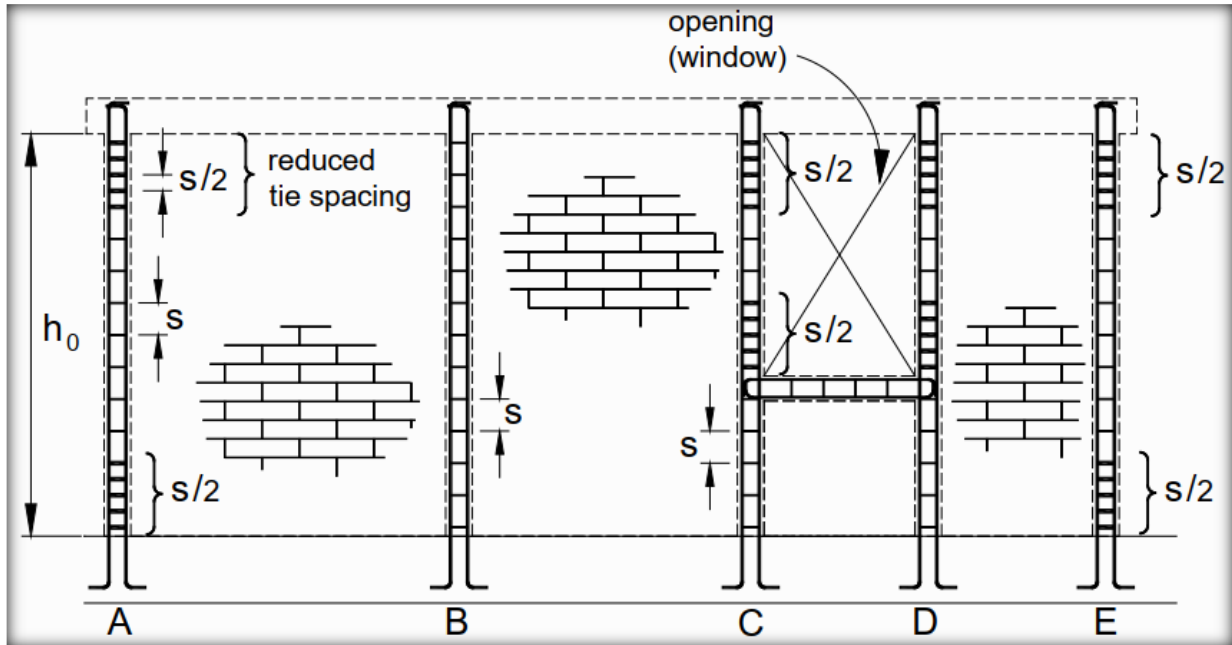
Spacing of transverse reinforcement (ties) in tie-columns
